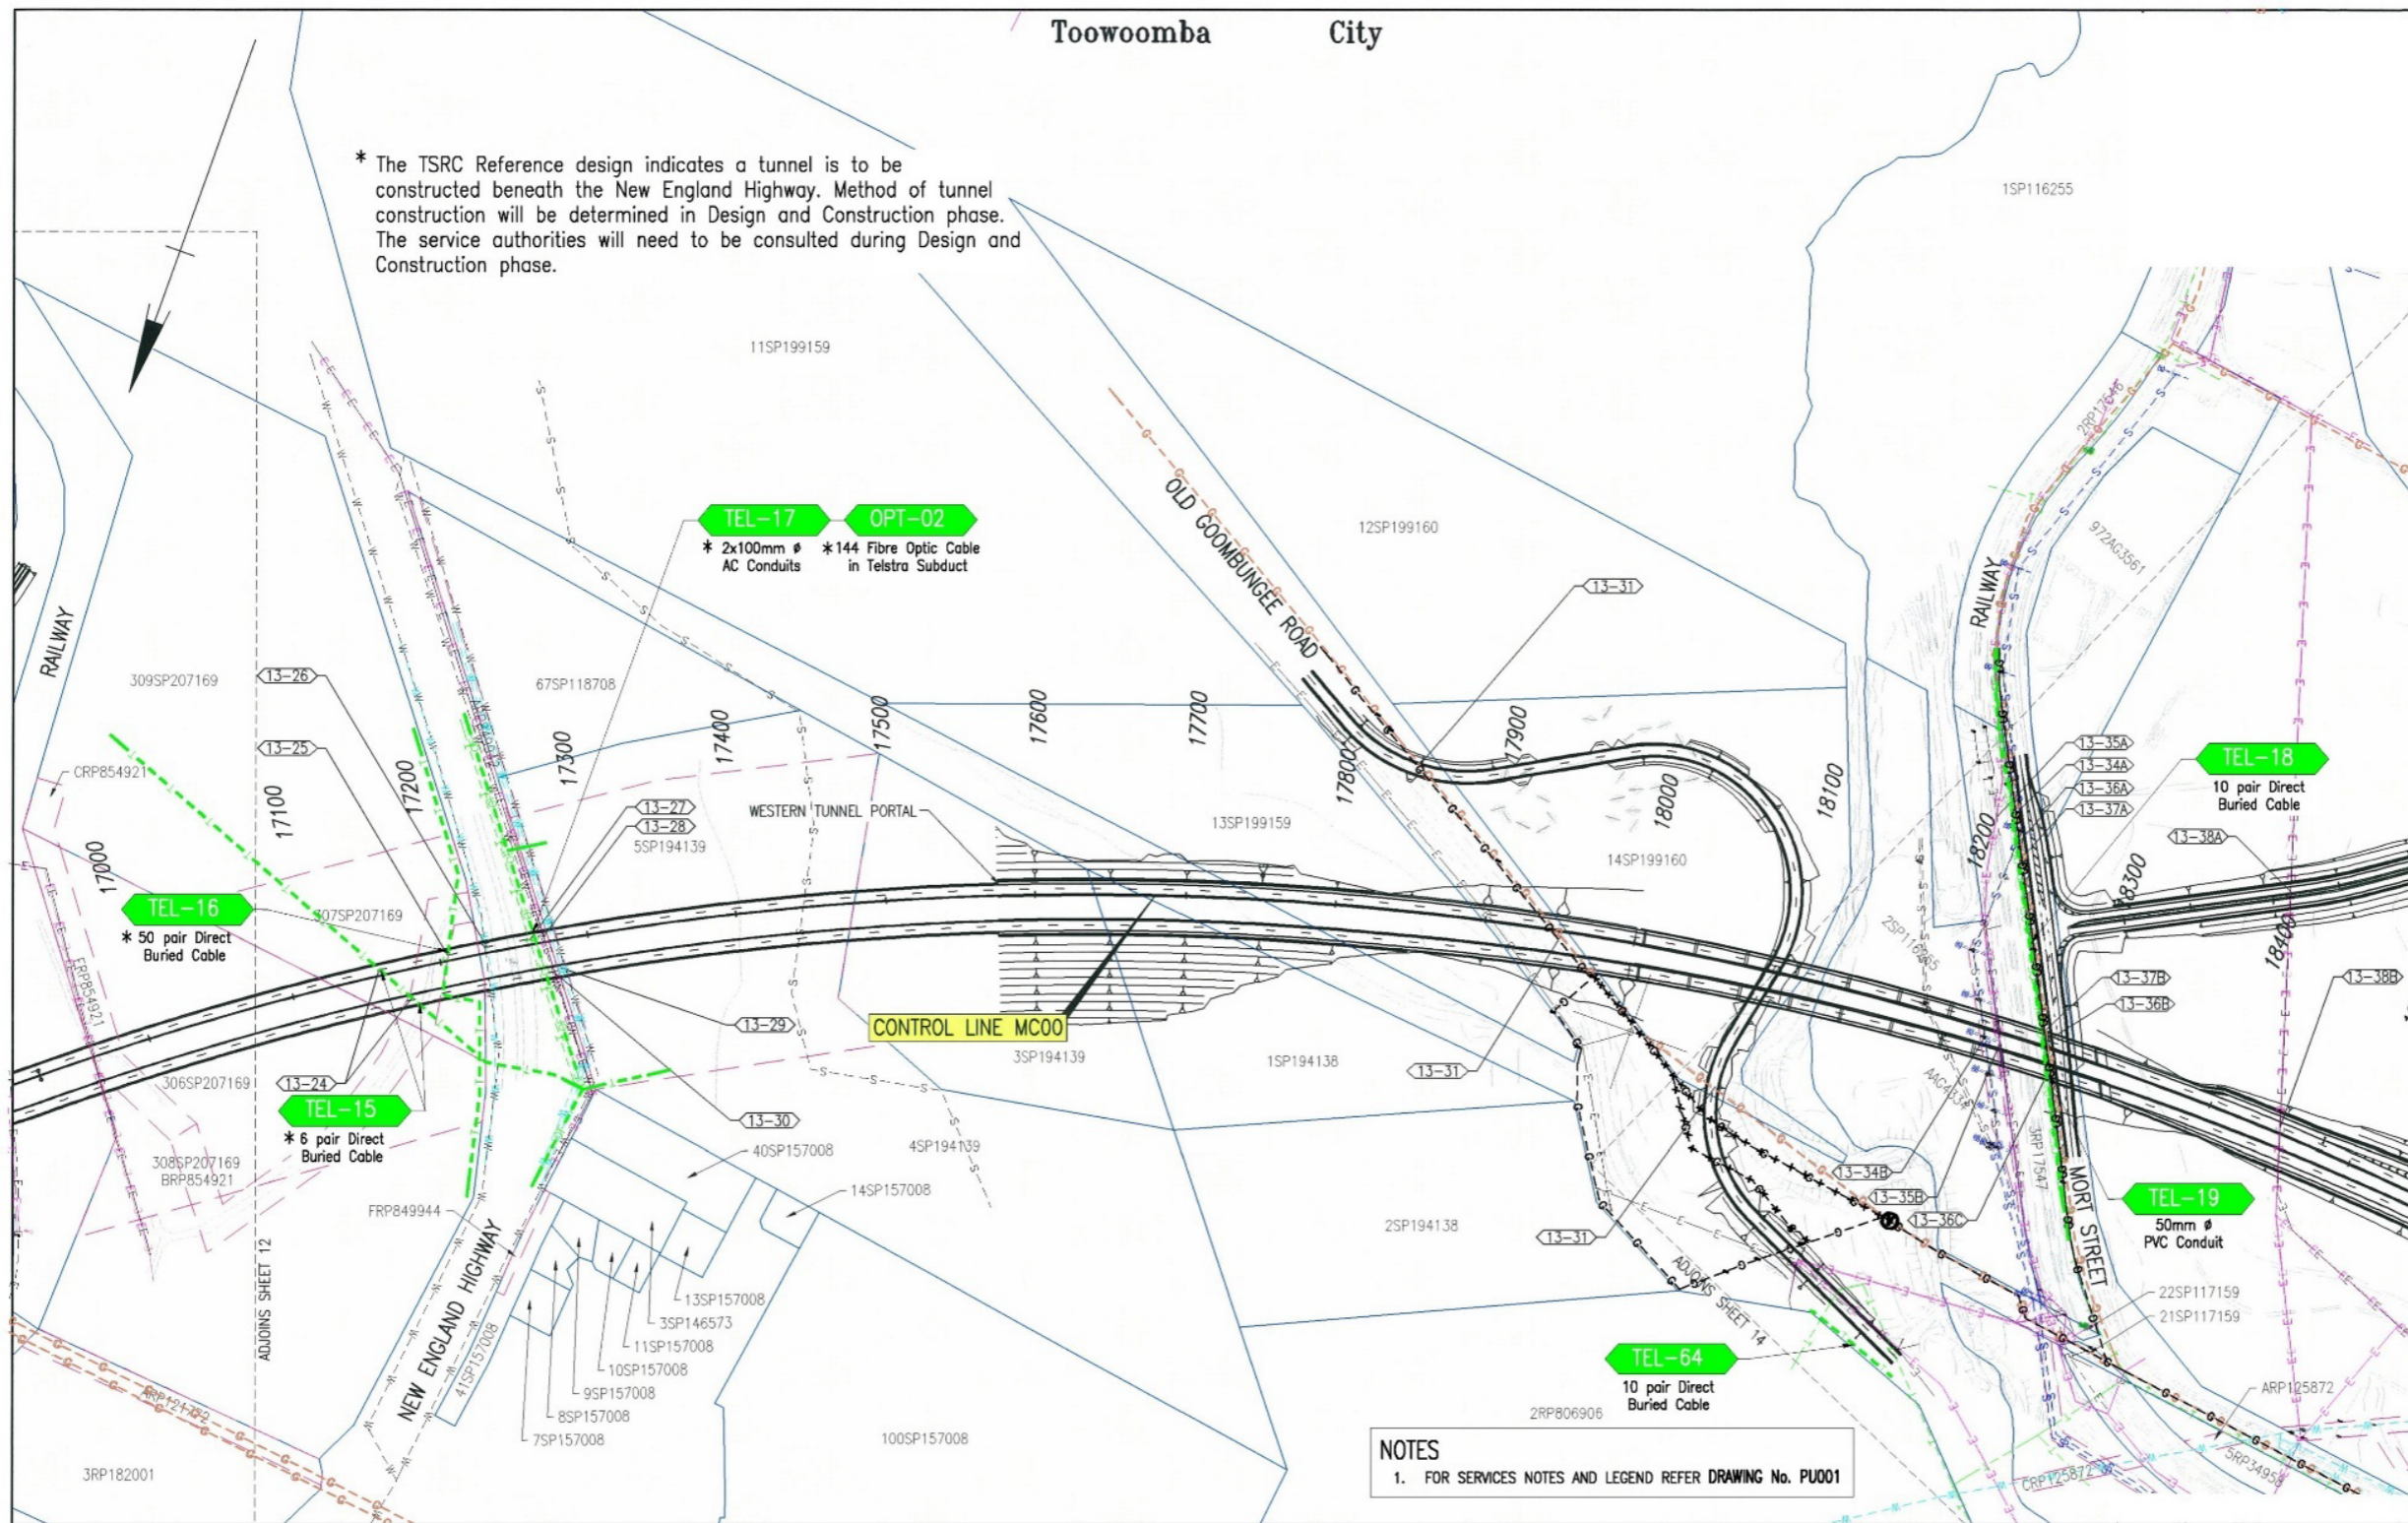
(f) – Public utility plant – Conflict Plans generic example – sheet 2 of 11
